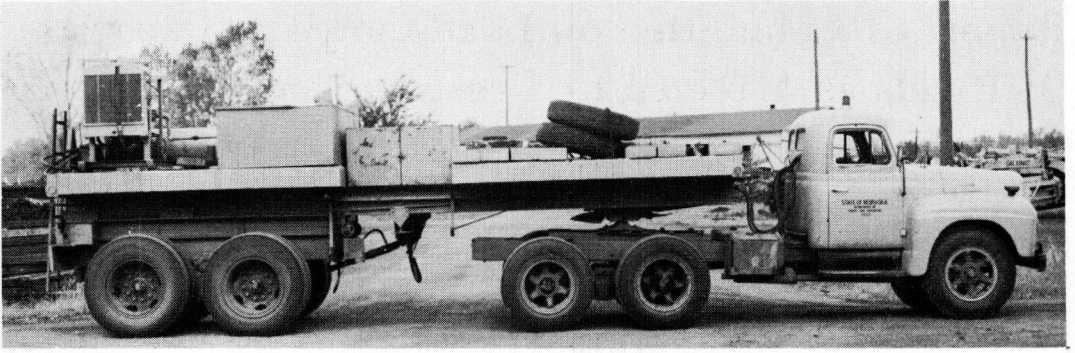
Tractor-trailer unit used for Nebraska plate-bearing tests.
